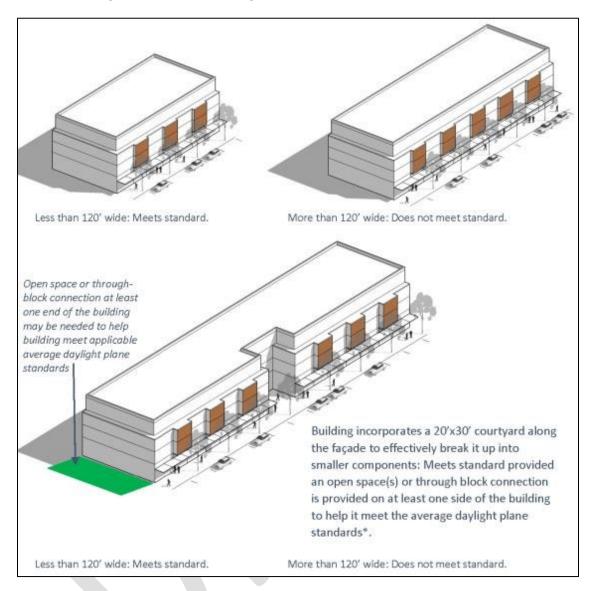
Facade Examples Employing Building Walls with Contrasting Articulation
